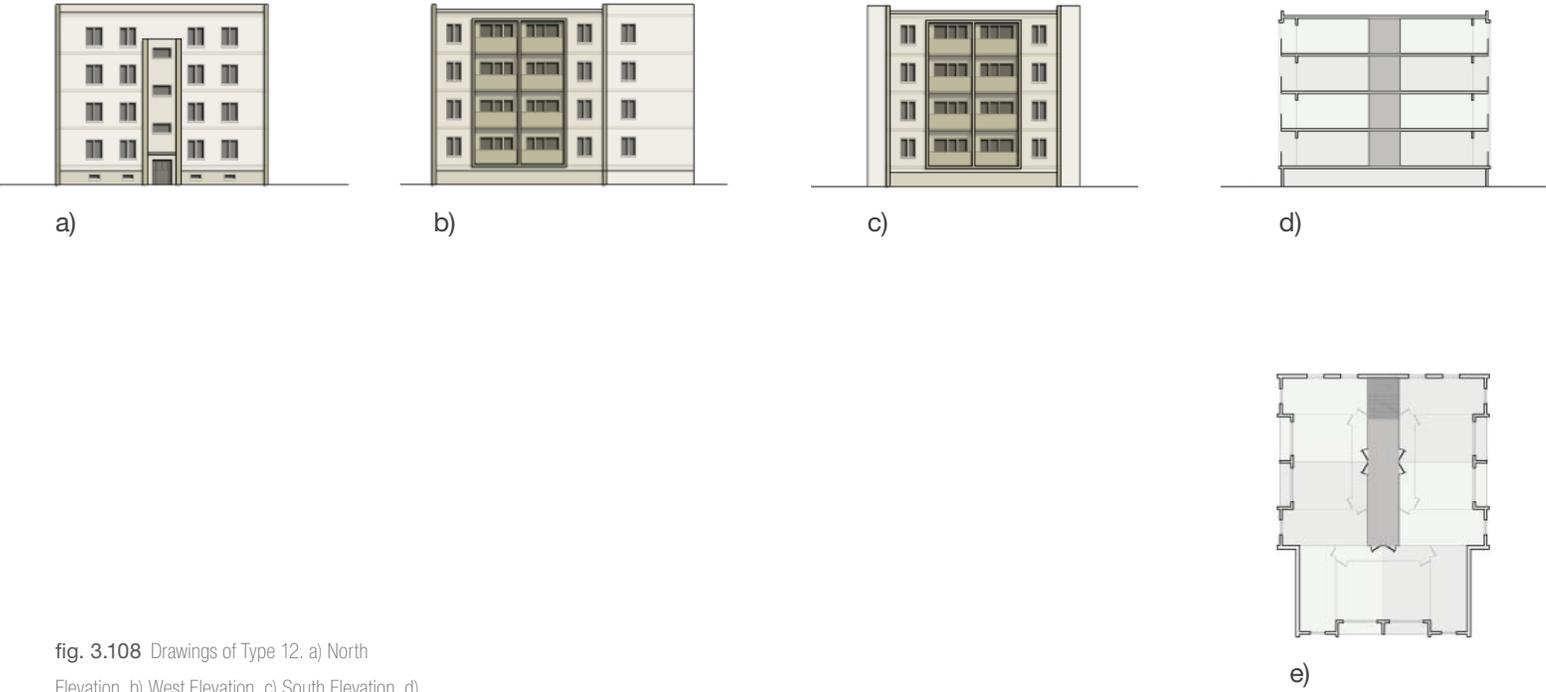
Drawings of Type 12. a) North Elevation, b) West Elevation, c) South Elevation, d) Typical Section, and e) Typical Plan. 1:500.
